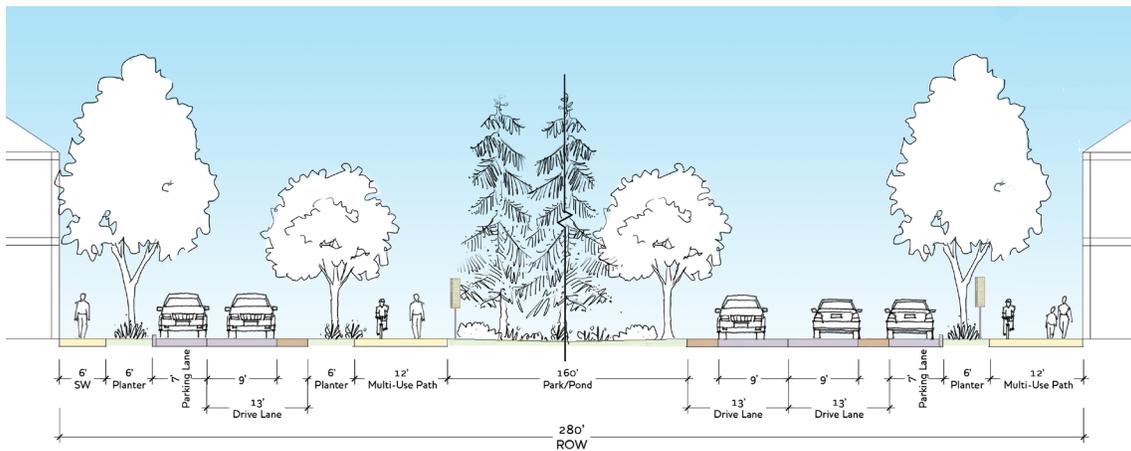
' R.O.W. "Park Street" (looking west)
